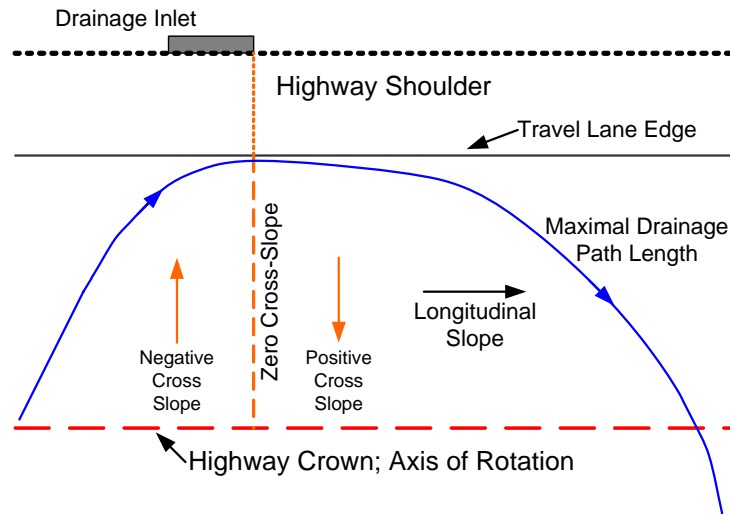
Schematic plan view of pavement near superelevation transition, showing the drainage path with maximum length.
